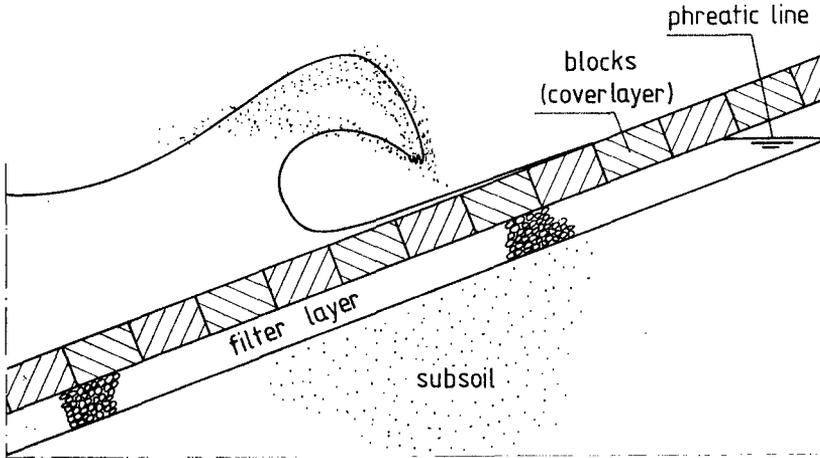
Typical cross-section of a placed block revetment with wave loading.
